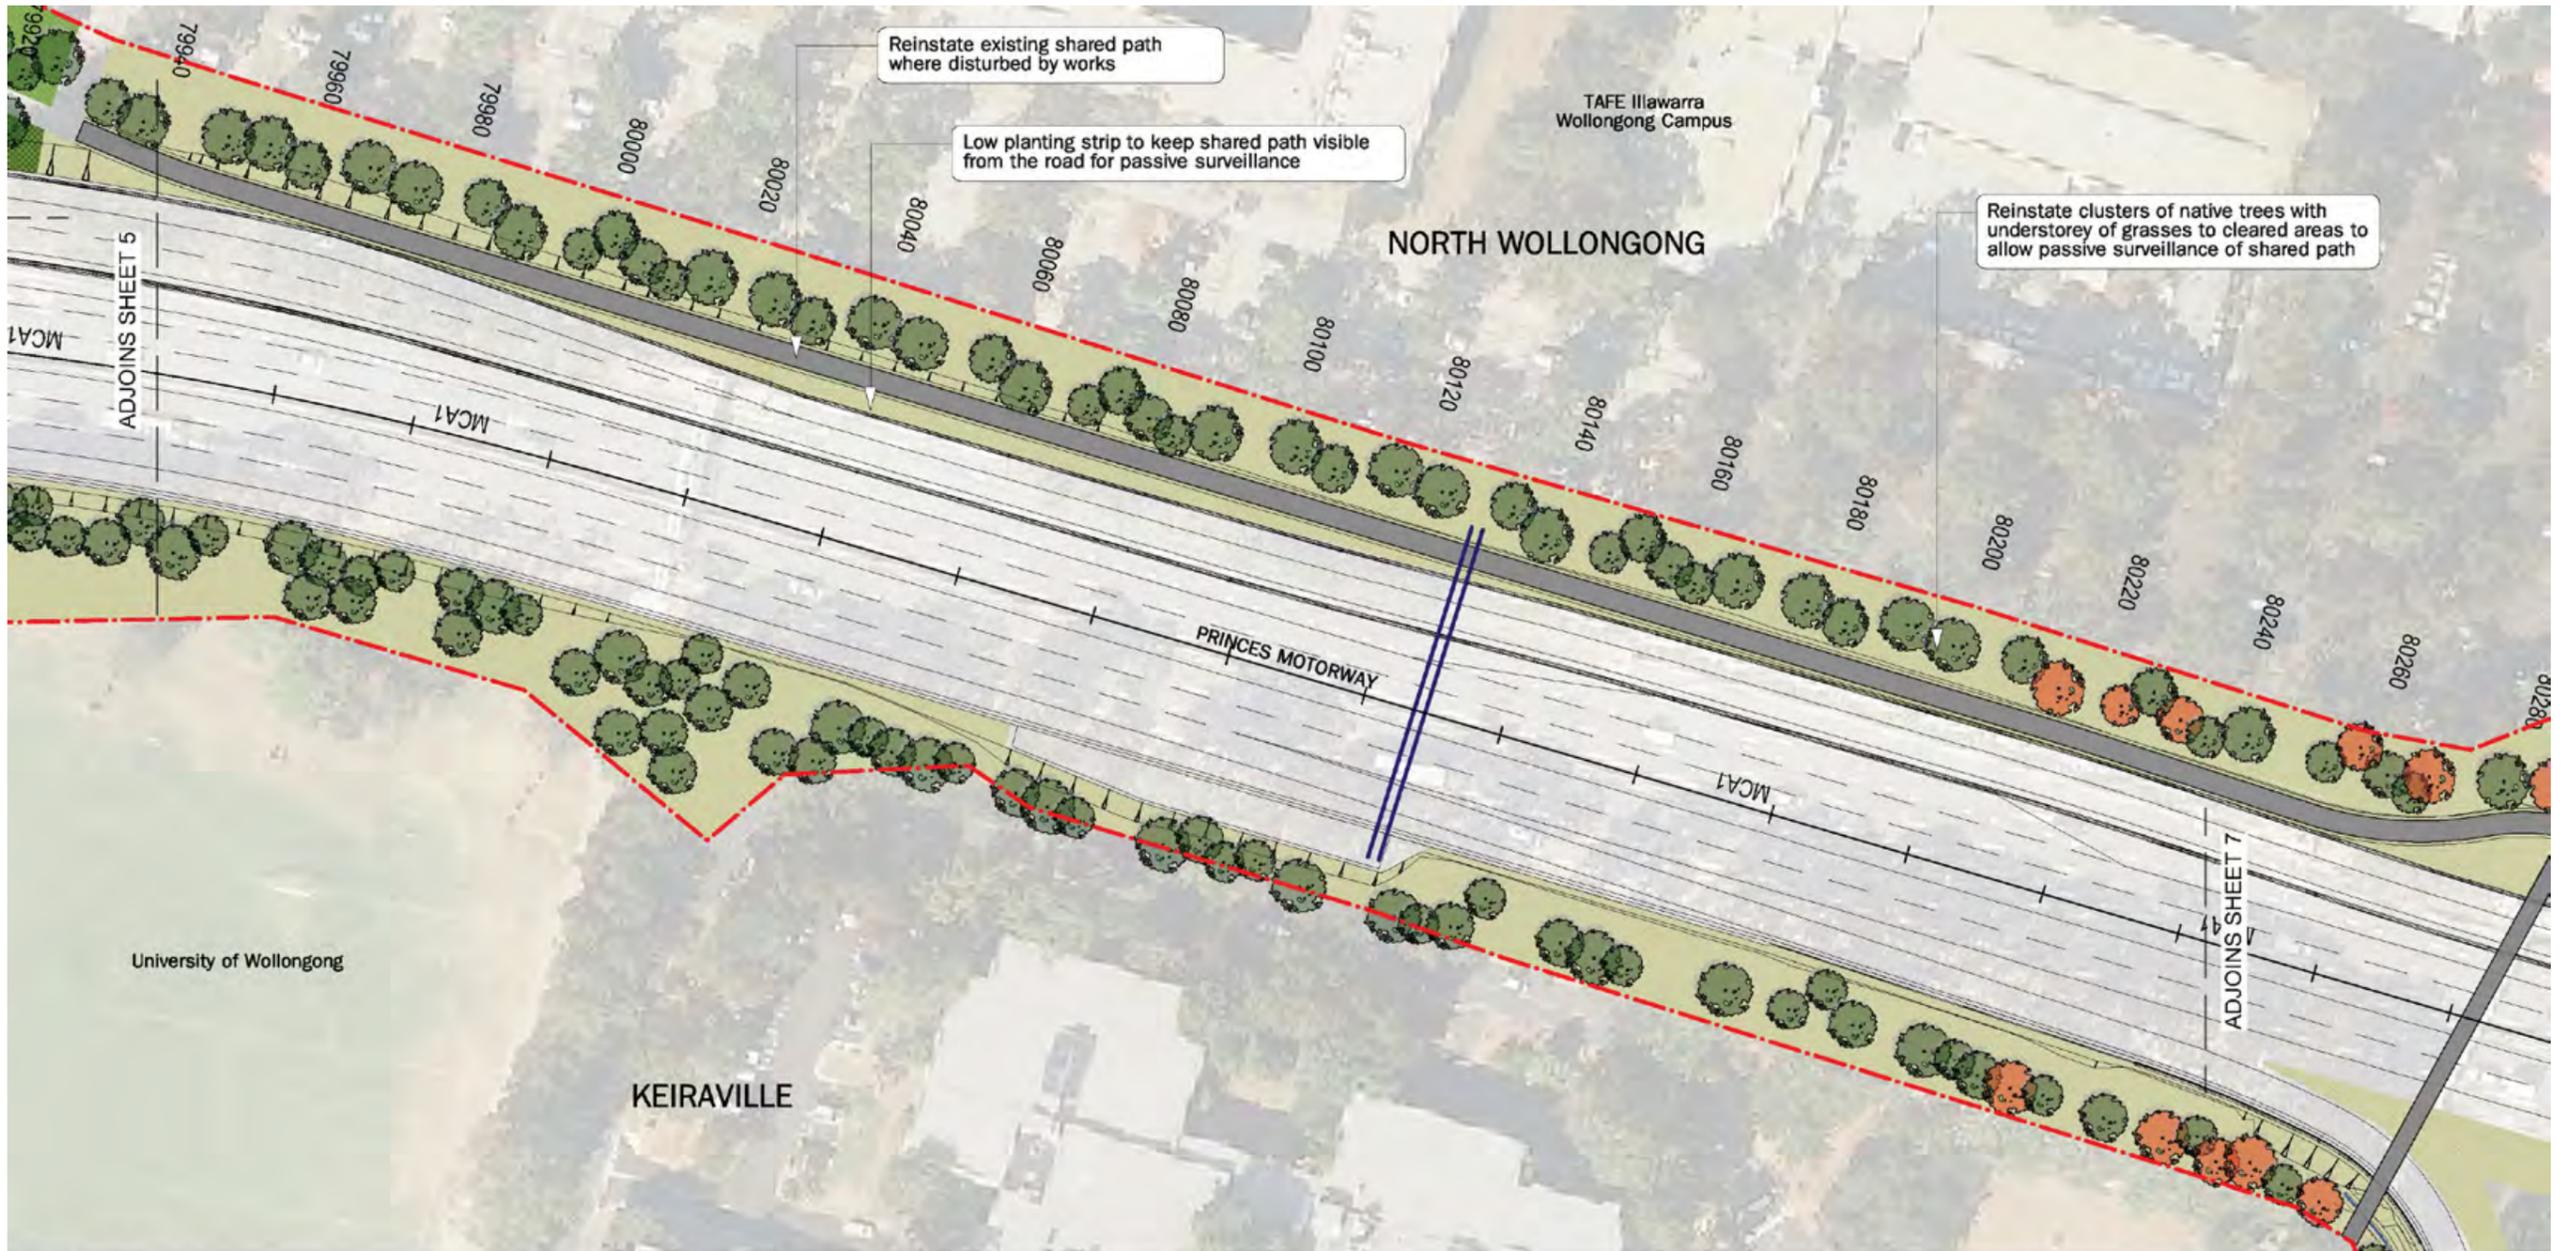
Urban and landscape concept design plan - Sheets 5 and 6 (Scale 1:1000)
